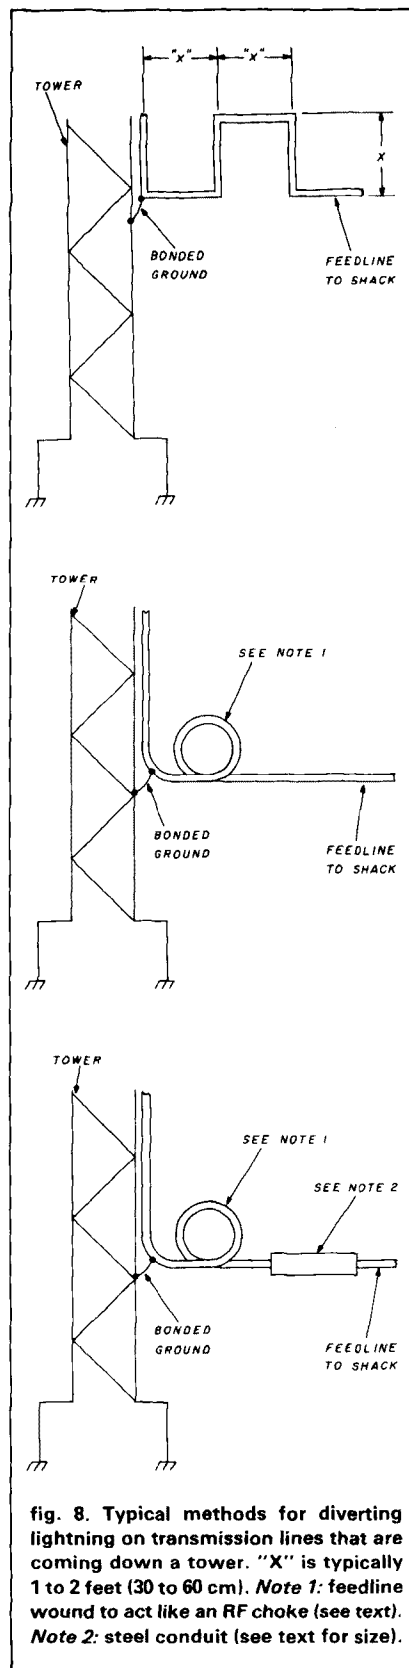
Typical methods for diverting lightning on transmission lines that are coming down a tower. "X" is typically 1 to 2 feet (30 to 60 cm). Note 1: feedline wound to act like an RF choke (see text). Note 2: steel conduit (see text for size).
